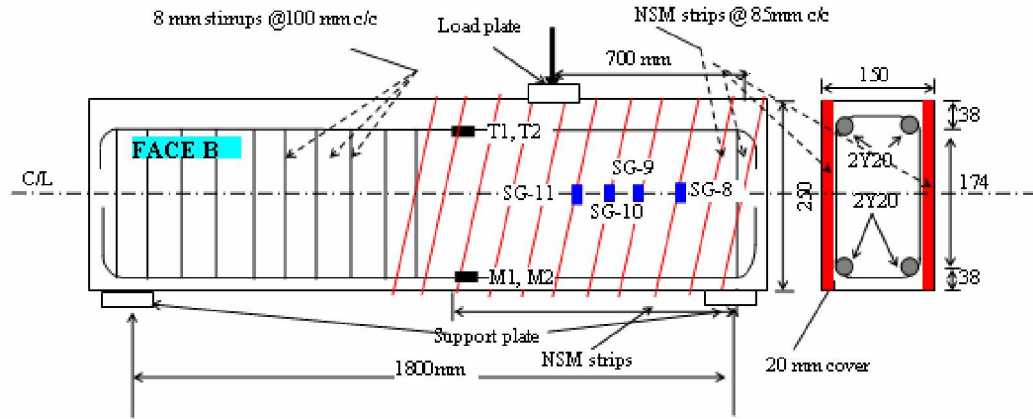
Arrangement of strain gauges on main bars and on NSM Steel Strips (Face B) (B1-SS)
